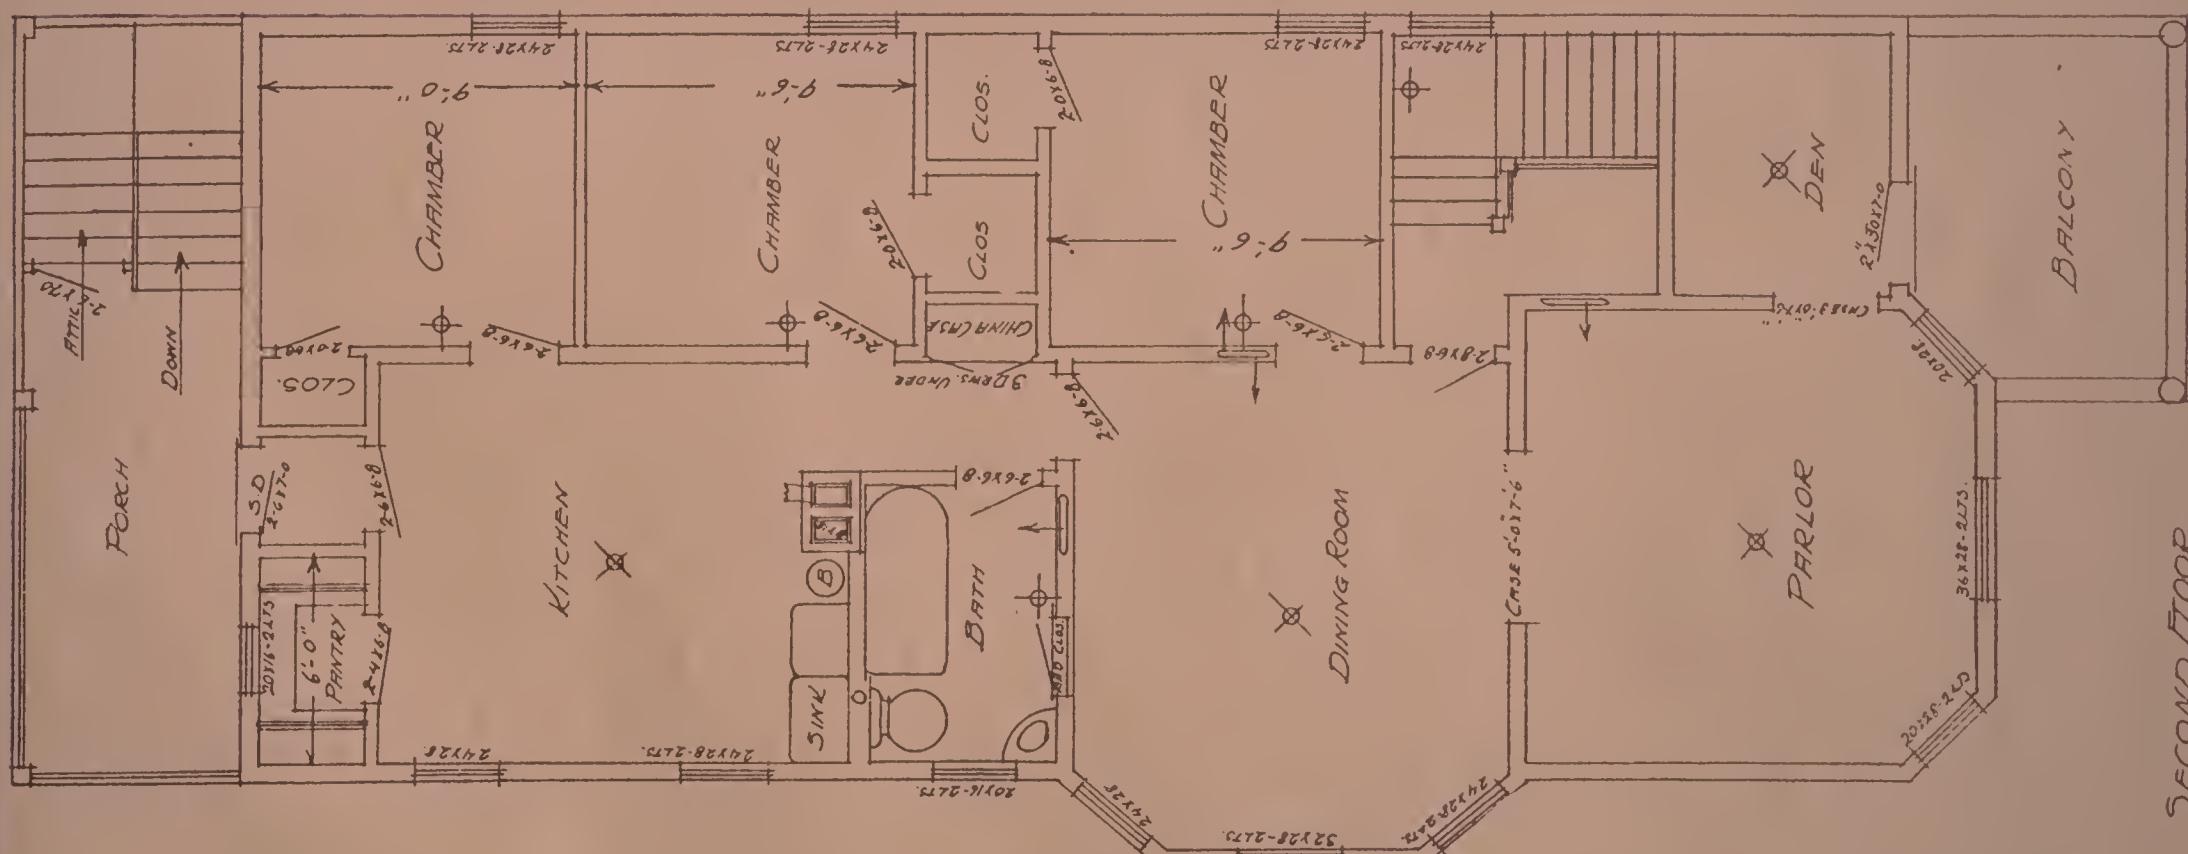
PLATE XIVb.—Second floor plans of two-family house erected at Schenectady, N. Y., from plans drawn by C. G. Van Rensselaer of Schenectady, N. Y. Cost, \$3,400.00.
